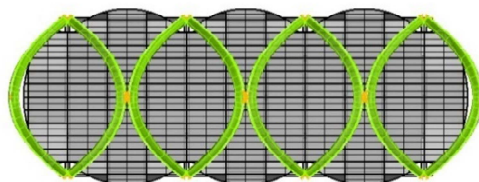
Floor panel system layout & floor module unit. (By author) (Sycon website)
